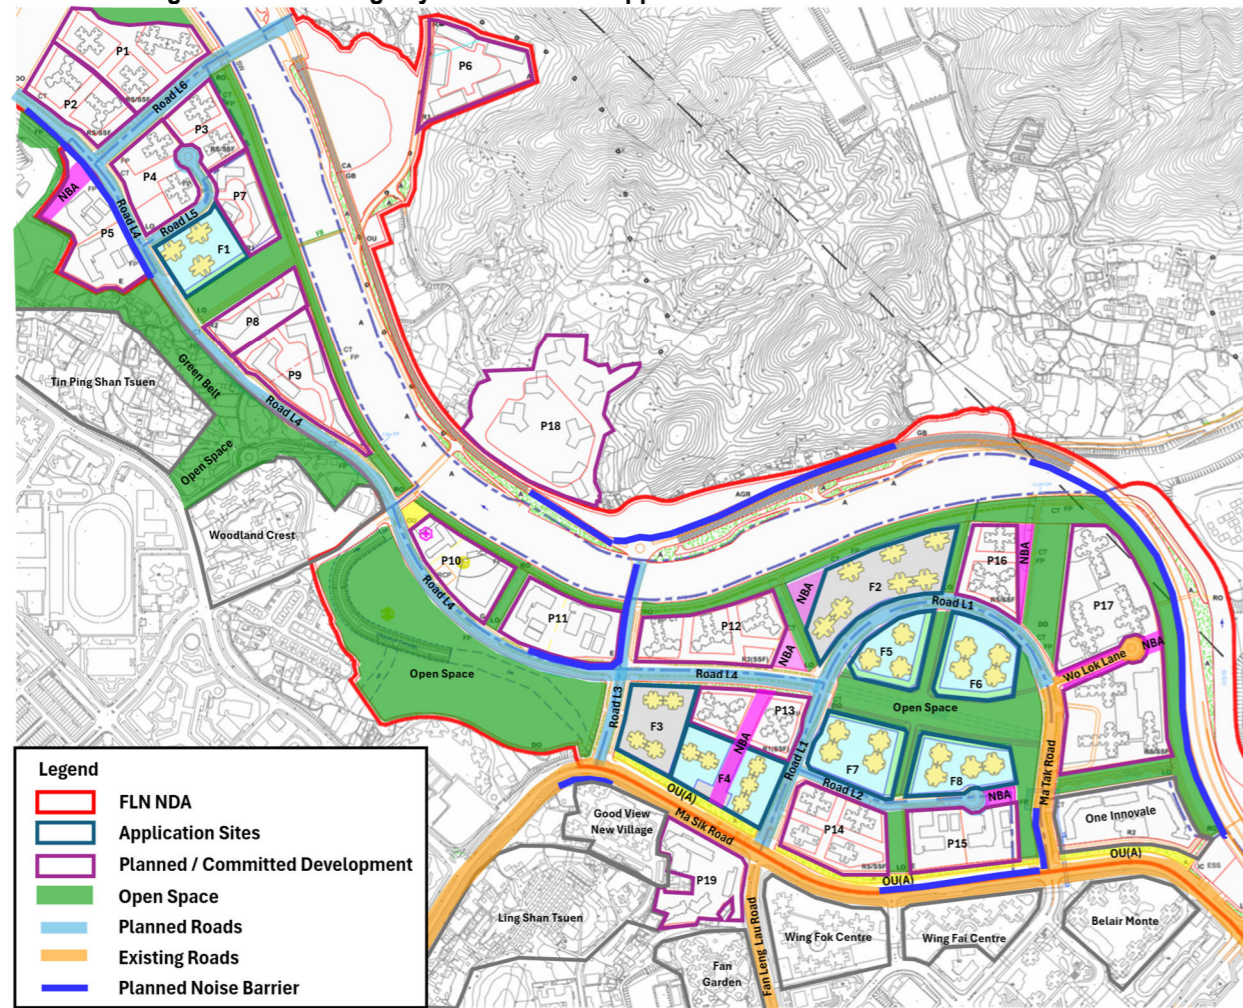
Building Layouts within the Application Sites under the Proposed Scenario
